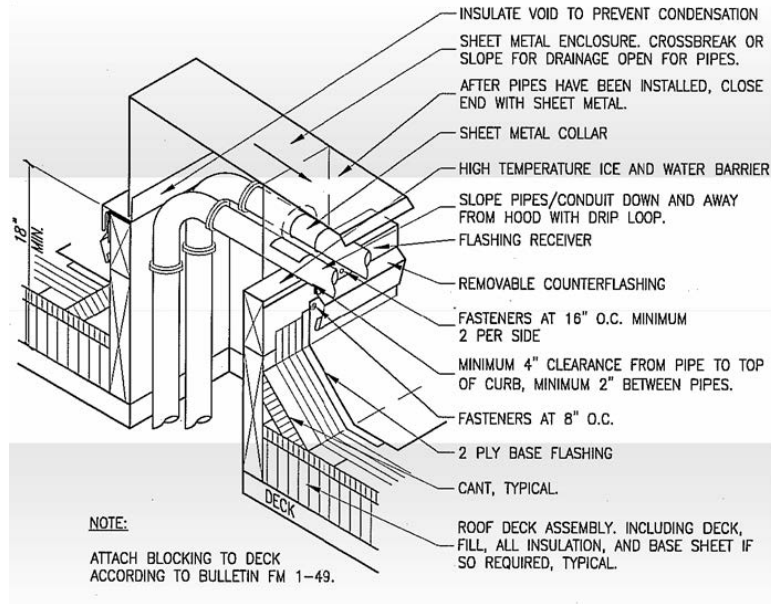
TYPICAL PIPE AND CONDUIT ROUTING DETAIL FOR ROOF INSTALLATIONS
